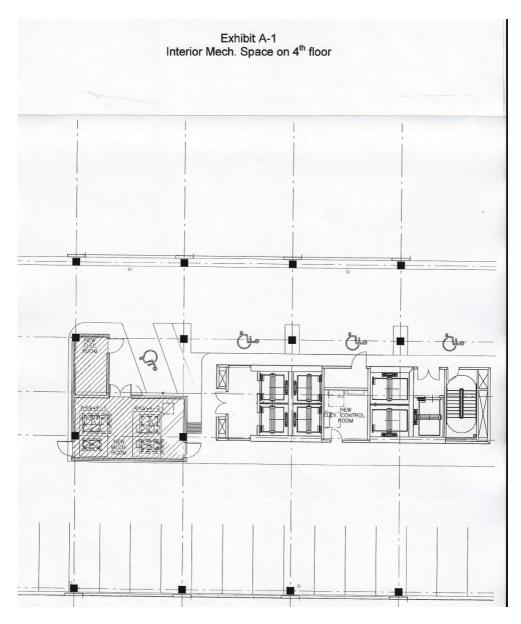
FLOOR PLAN OF THE MANUFACTURING SPACE
